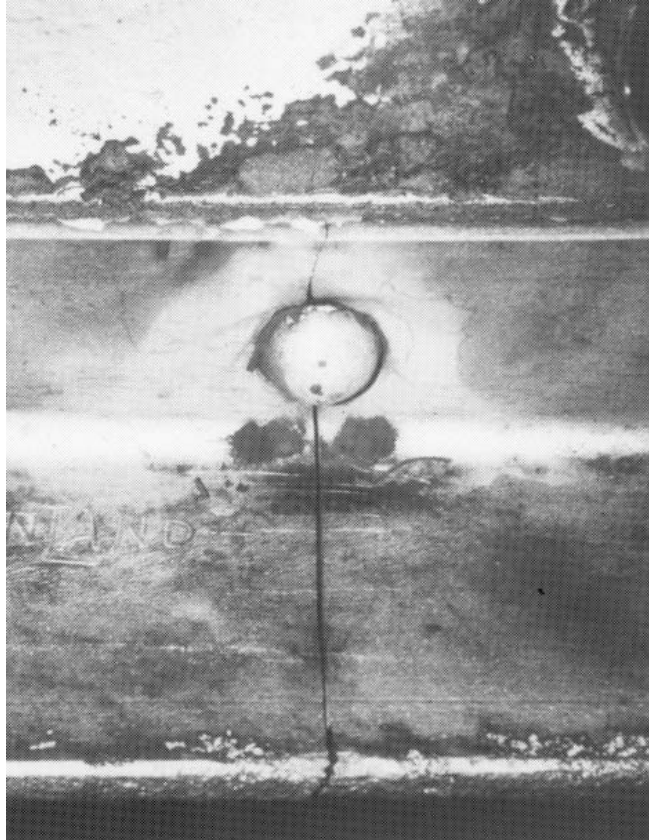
Typical fatigue cracking of riveted member
